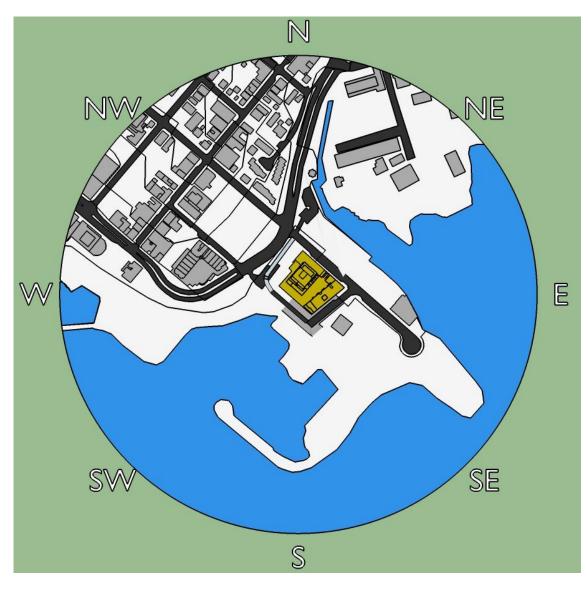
Proximity Model Plan for the Proposed Site Conditions
